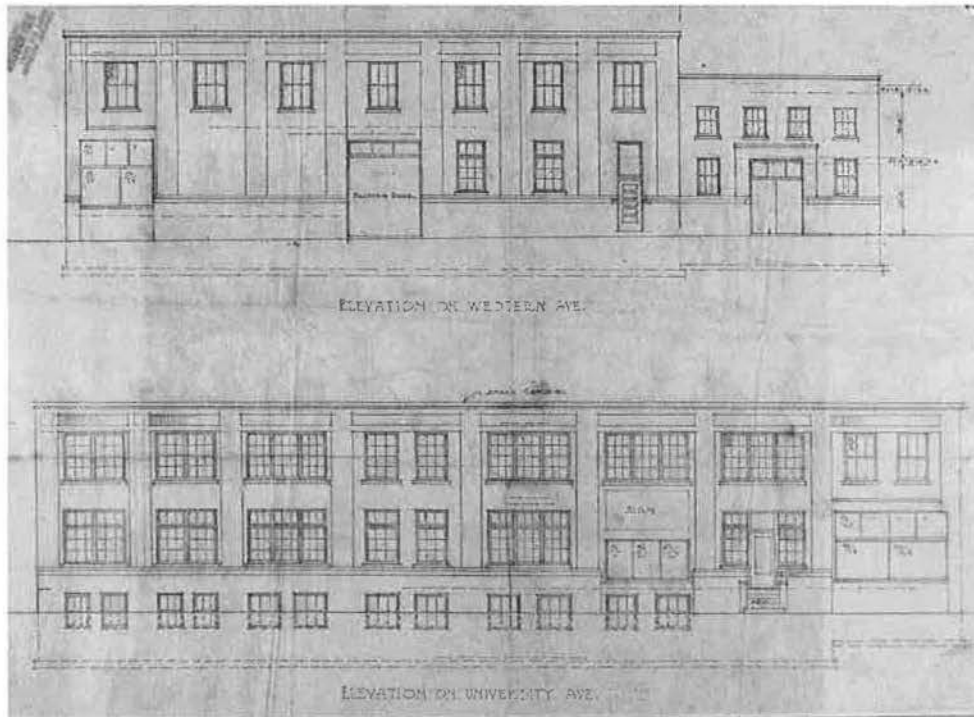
1931 scaled elevations of the plant - Western Avenue and University Avenue.
